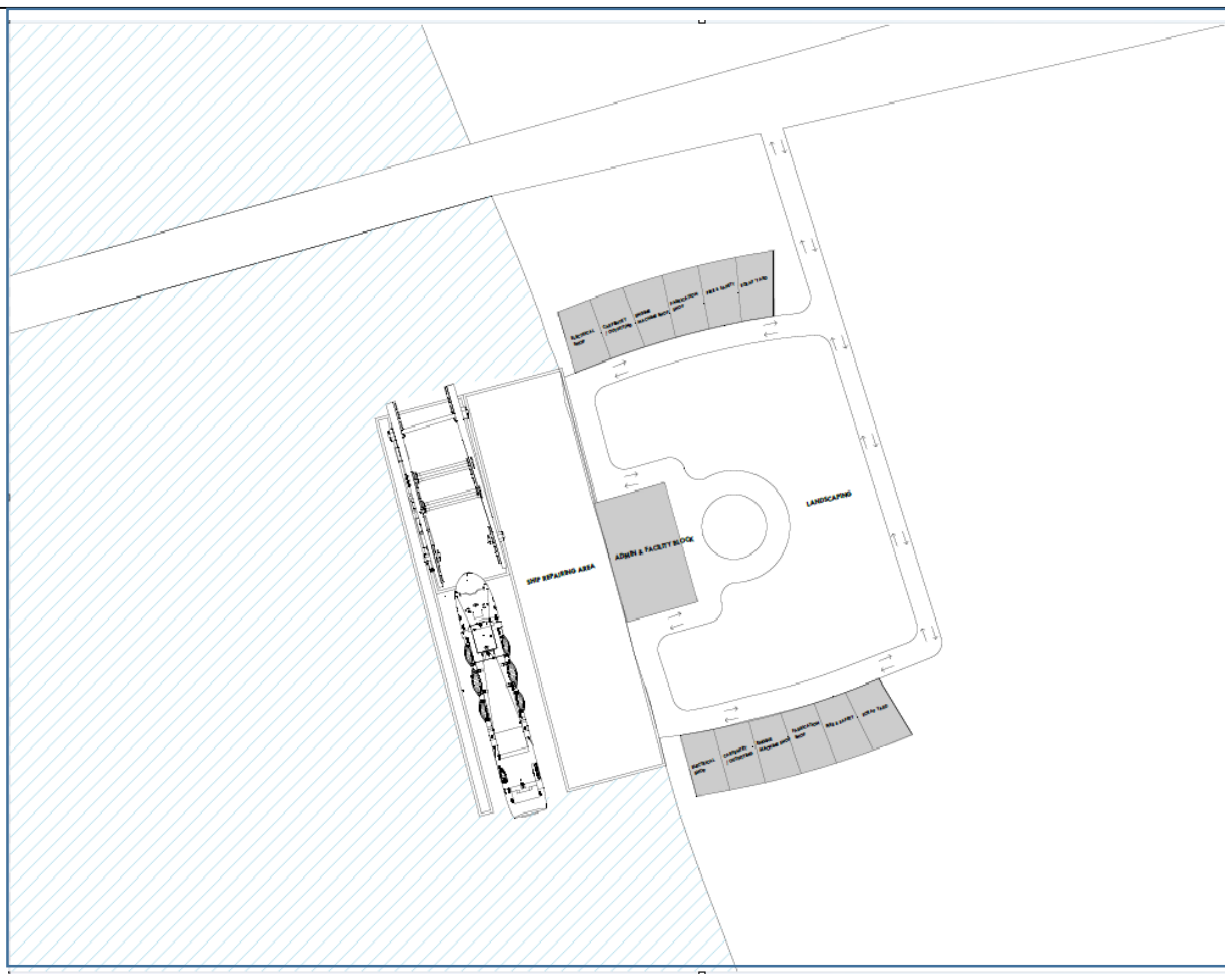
1 Layout for Proposed ship repair facility land side structures
